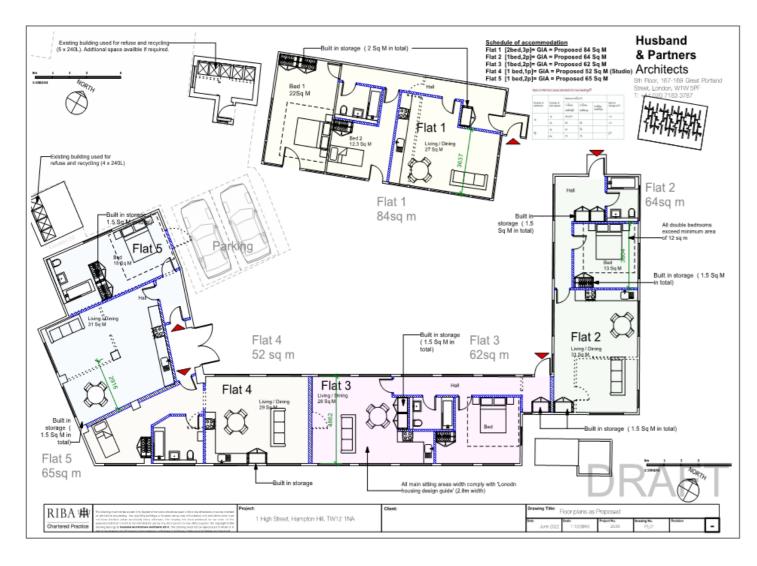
Proposed Floor Plans with Residential Units x 5 Nos.
